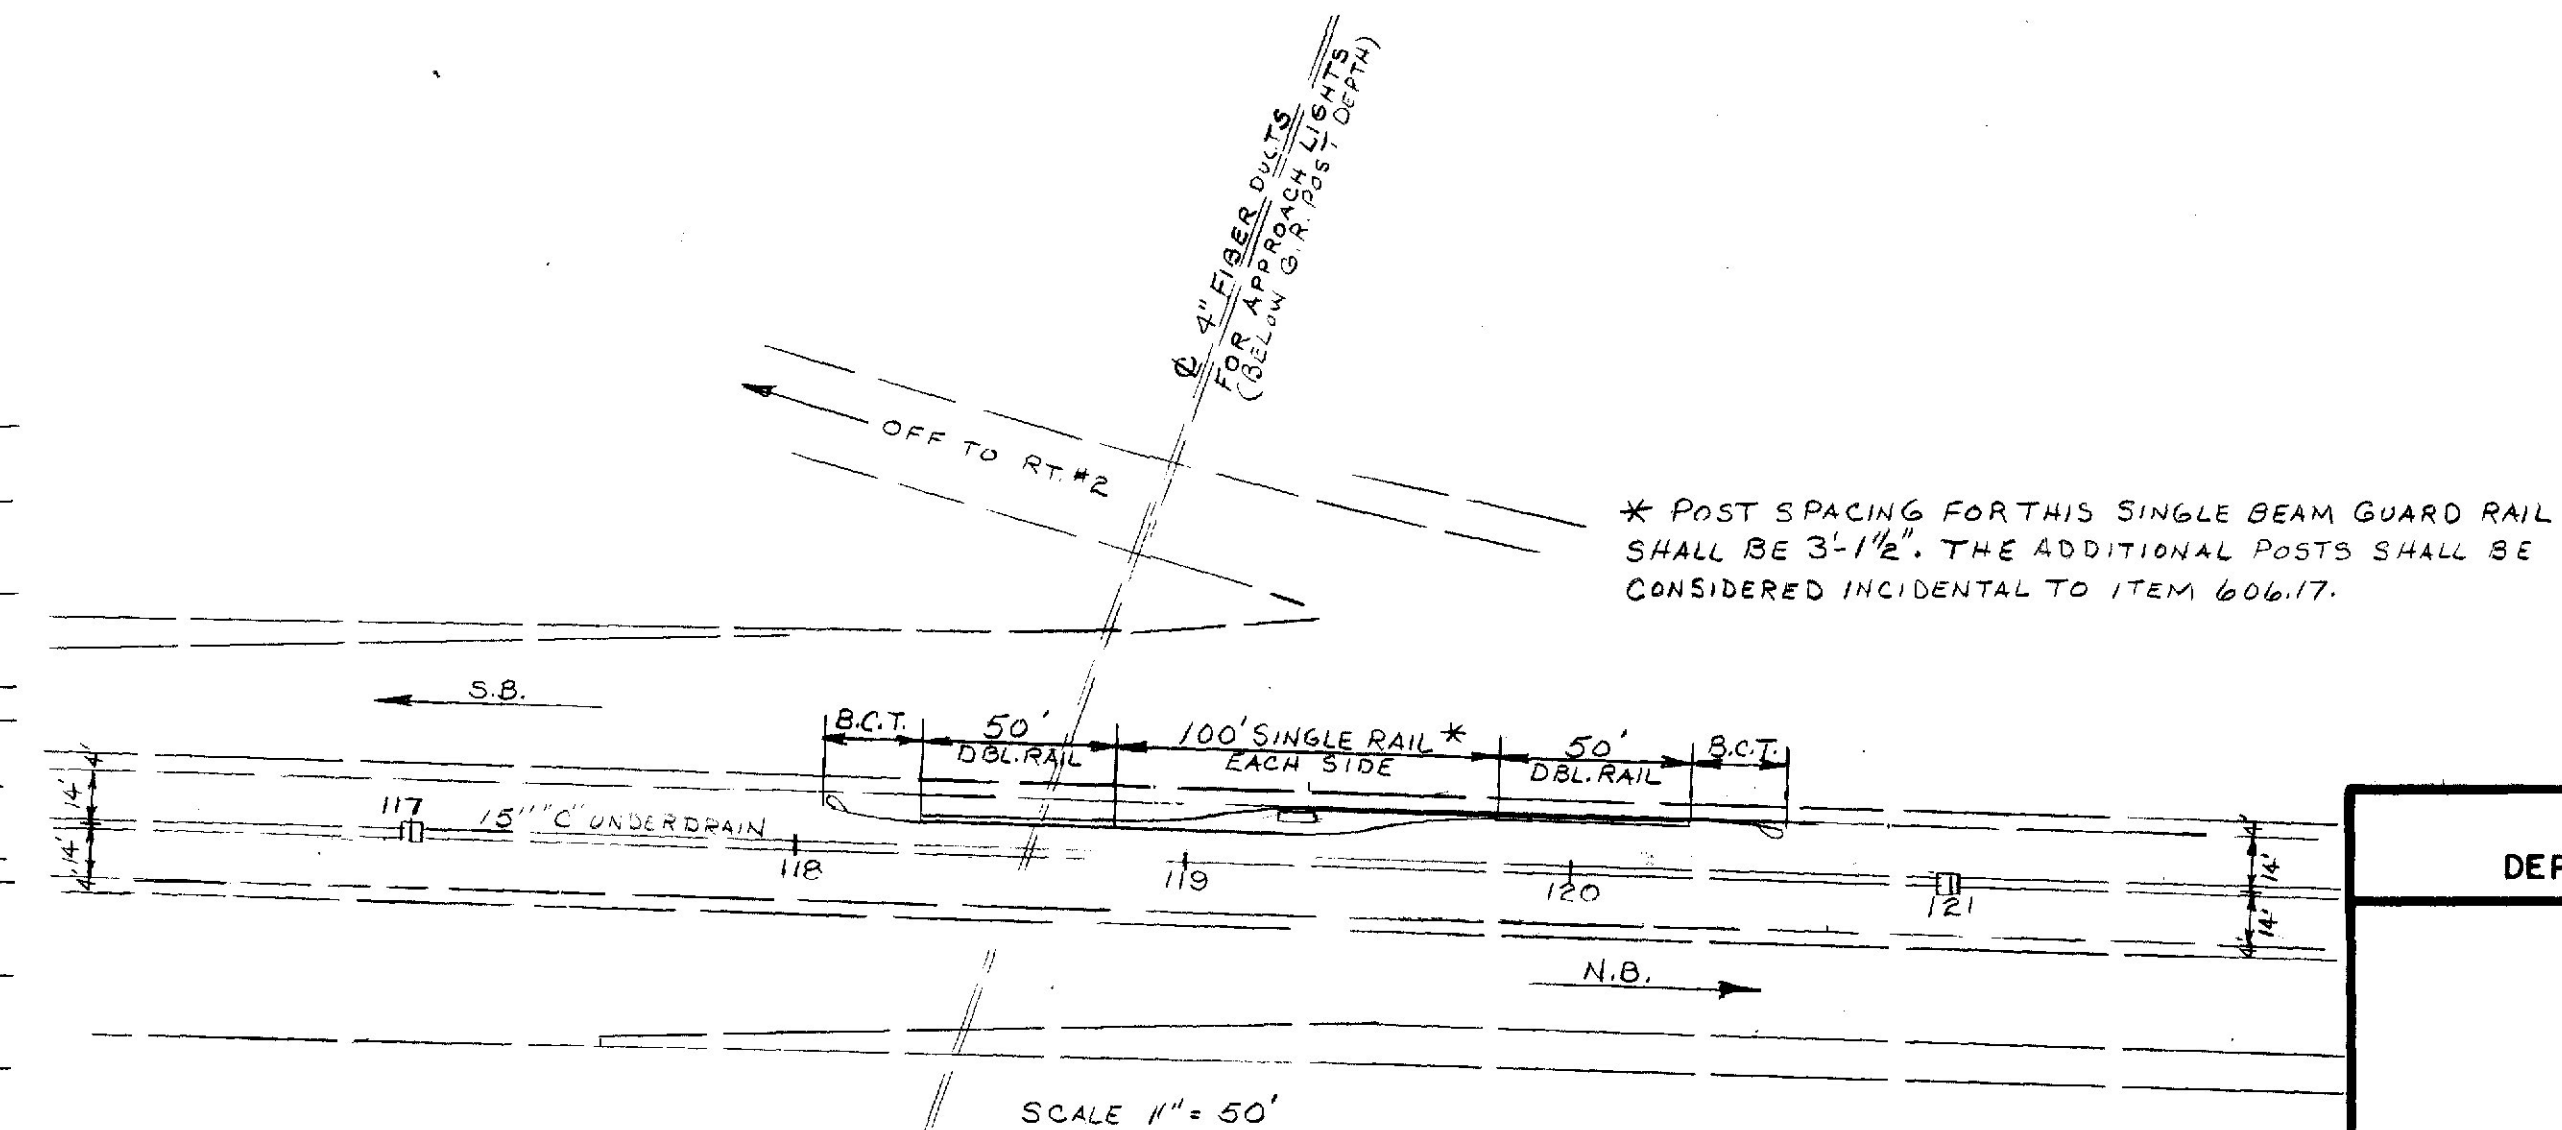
DETAIL OF PROPOSED GUARD RAIL PROTECTION AGAINST SIGN BRIDGE BASE
